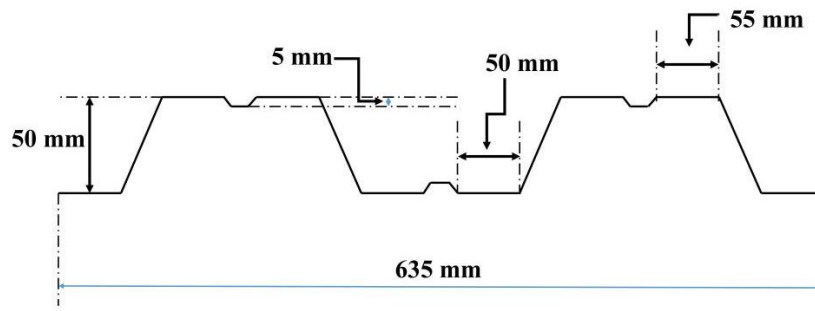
Geometrical details of the profiled decking sheet (mm).
